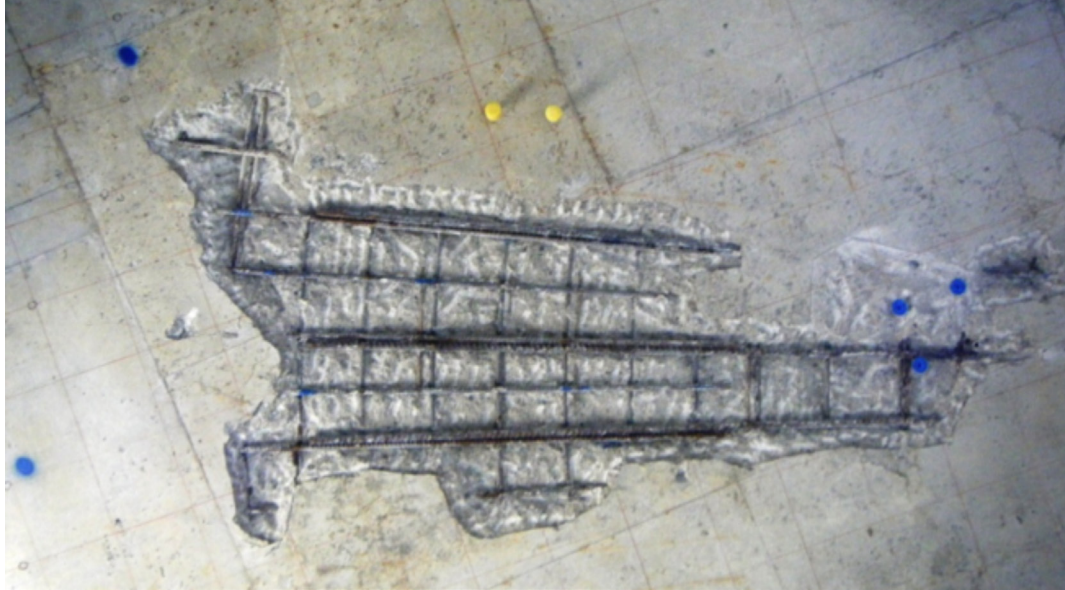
Concrete removal identified bar laps at a location of voiding at the slab soffit.
